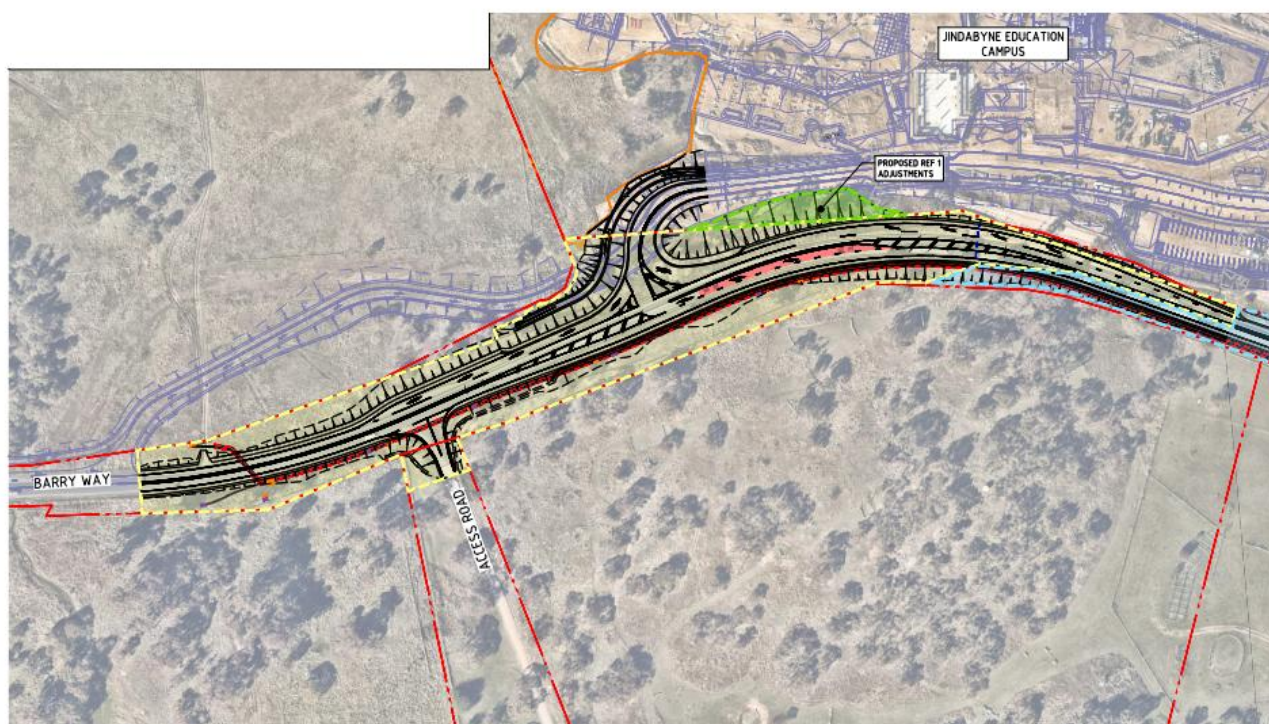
General Arrangement Plan REF 1 & REF 2 – The REF 1 Boundary (existing area shown in yellow & additional area shown in green)
